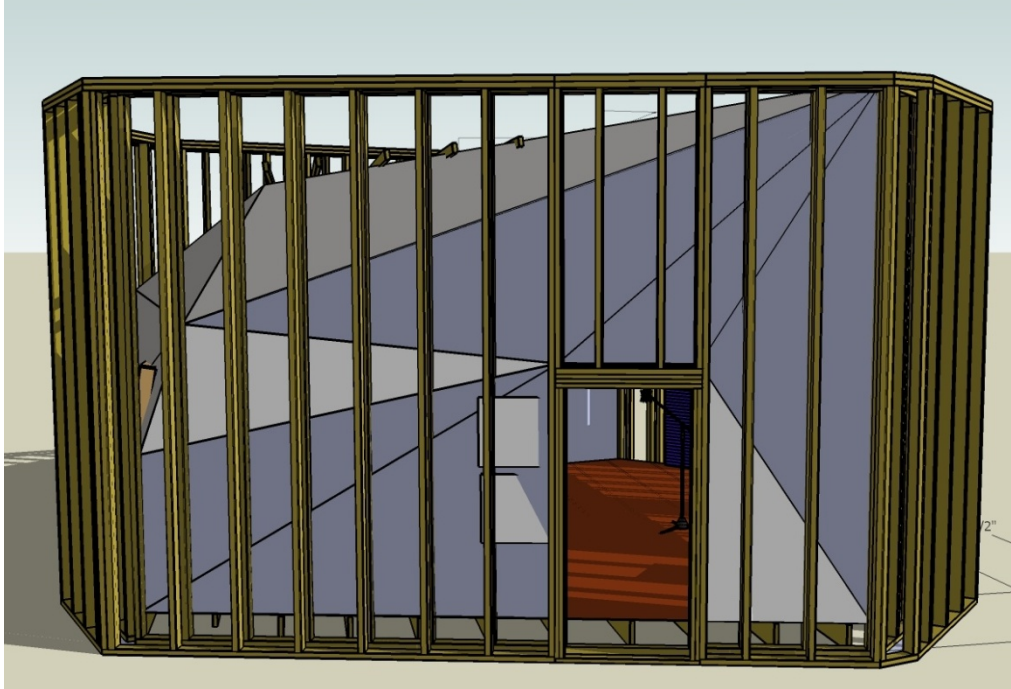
Spaced double wall construction used on the outer shell of the control room.
